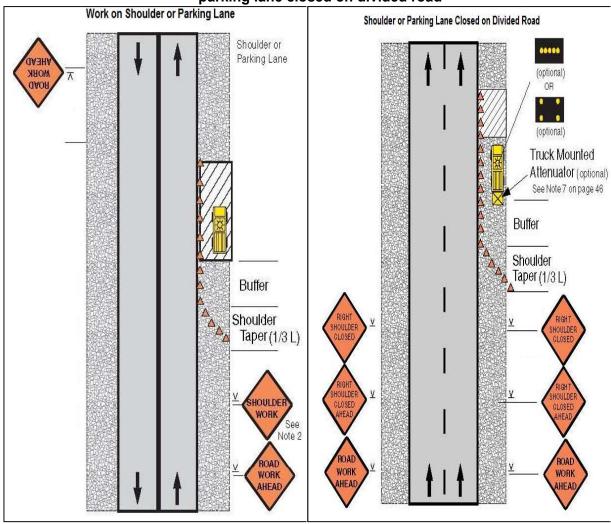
and A11.3: Work on shoulder or parking lane and Shoulder or parking lane closed on divided road
